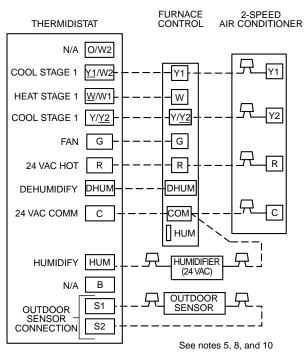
Single-Stage Furnace with 2-Speed Air Conditioner
